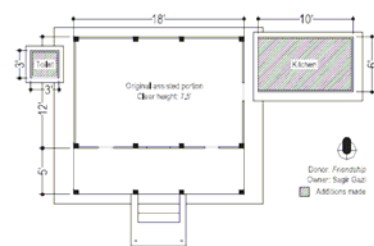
Showing Assisted shelter-type 7 (Friendship); plan and views (Author, 2008)
